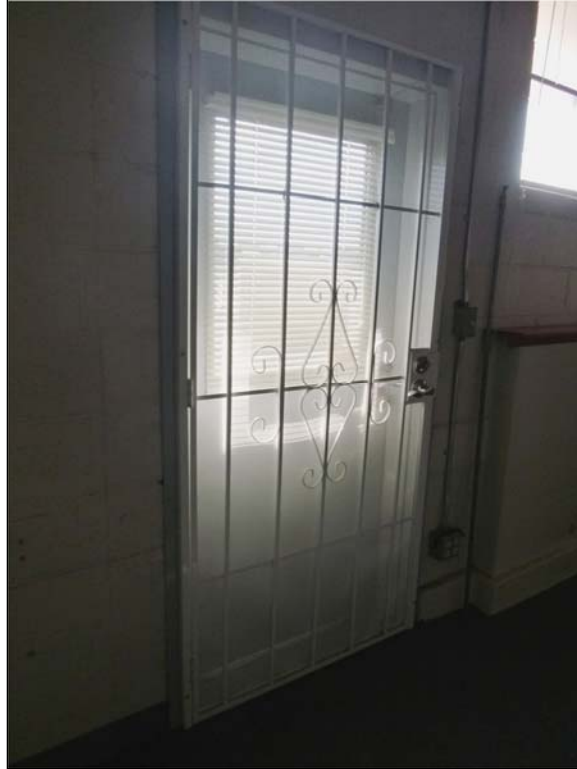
Interior locking screen door in what was the kitchen of the Annex; photo facing southeast.
